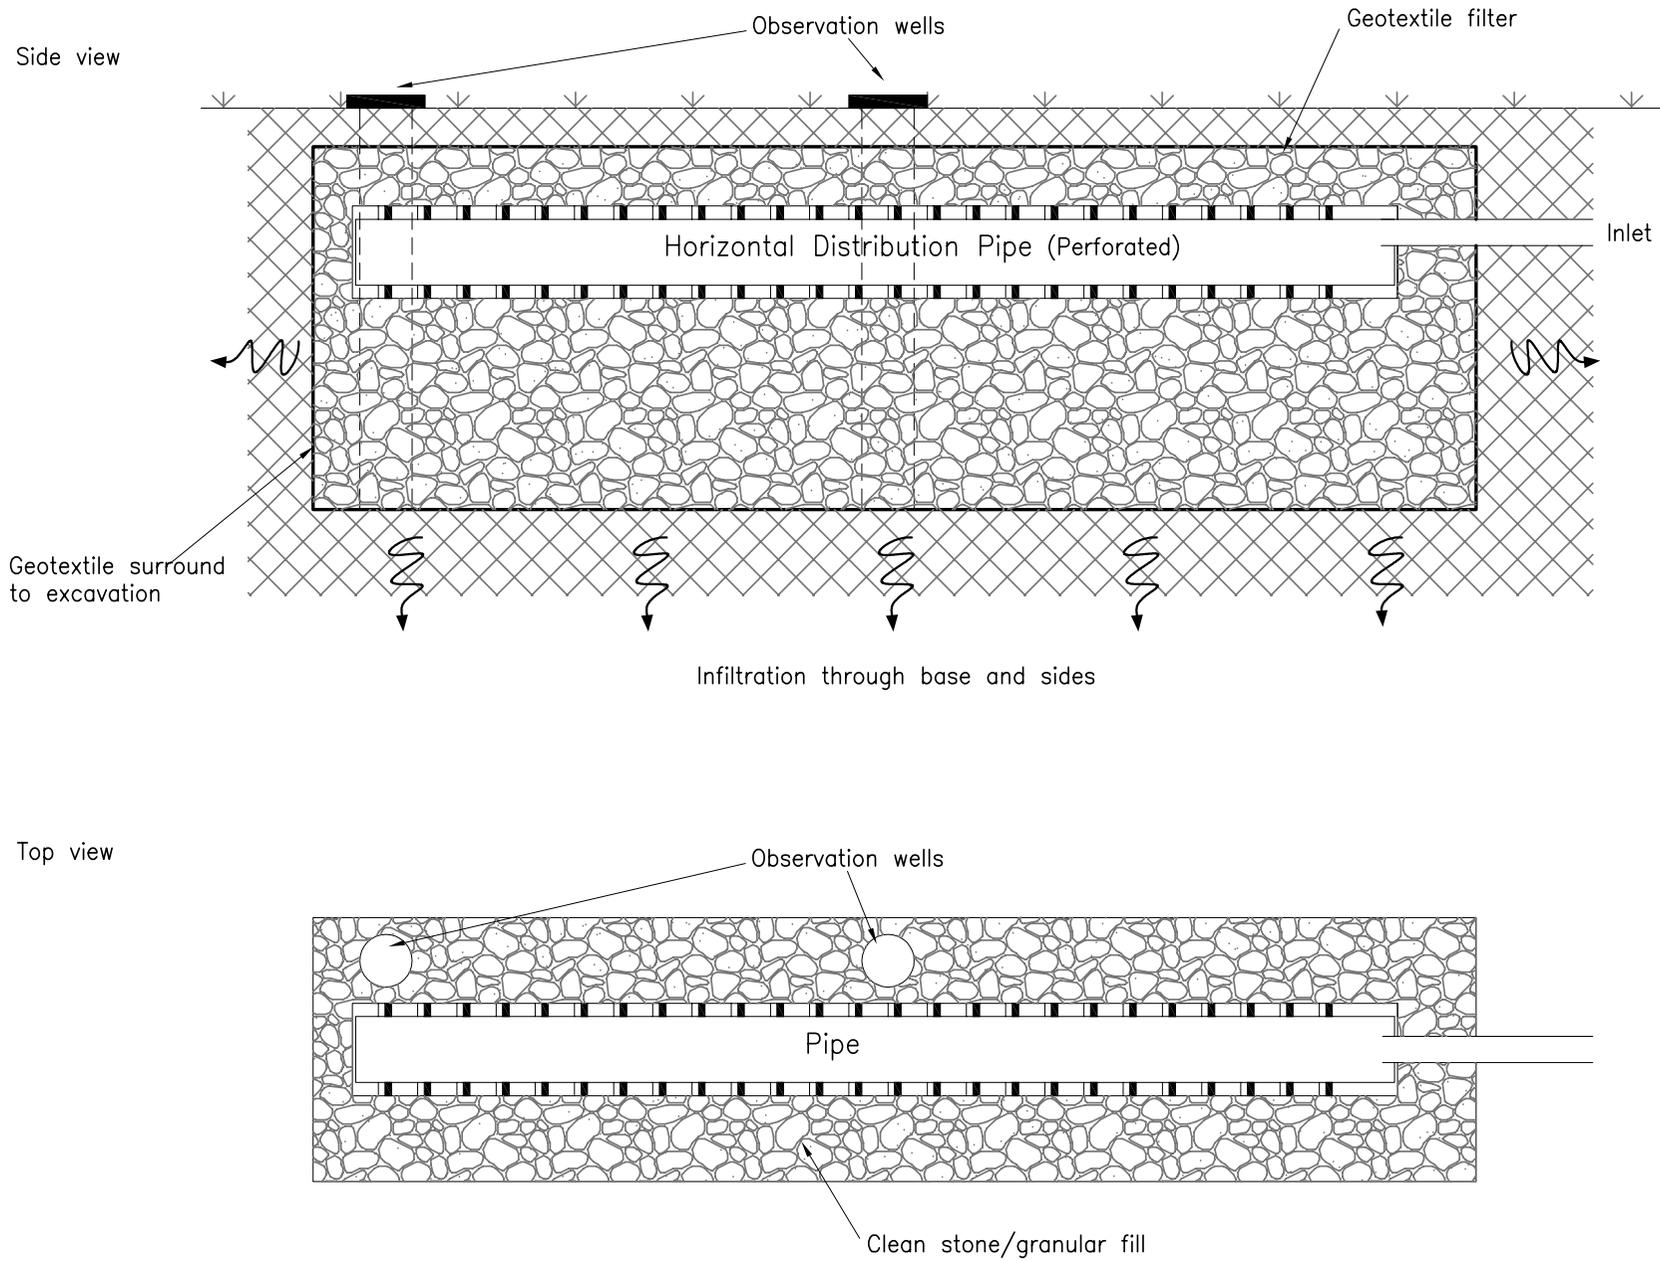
Trench Type Soakaway with Horizontal Distributor Pipe (After BRE Digest 365)
